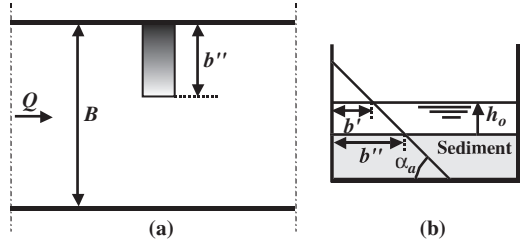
Sloping bridge abutment (a) plan, (b) section.
